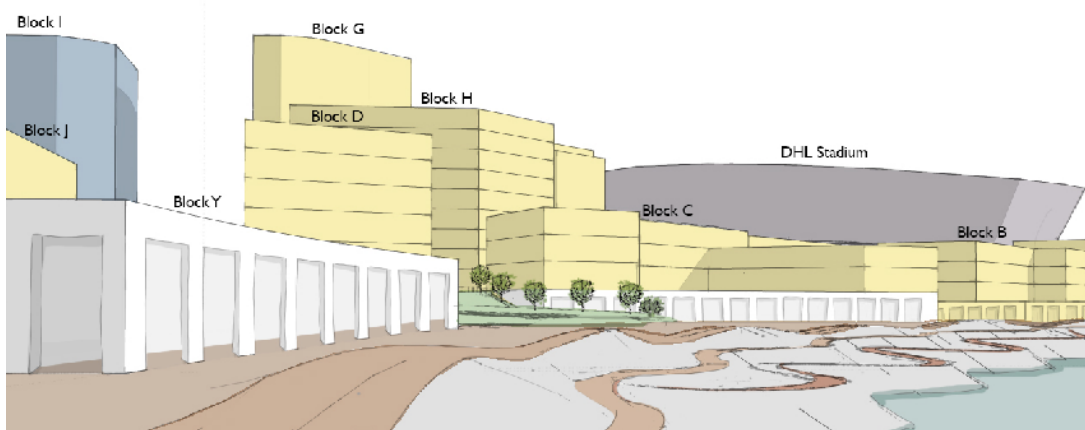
Taller buildings located on the corner of Beach Road and Granger Bay Boulevard
